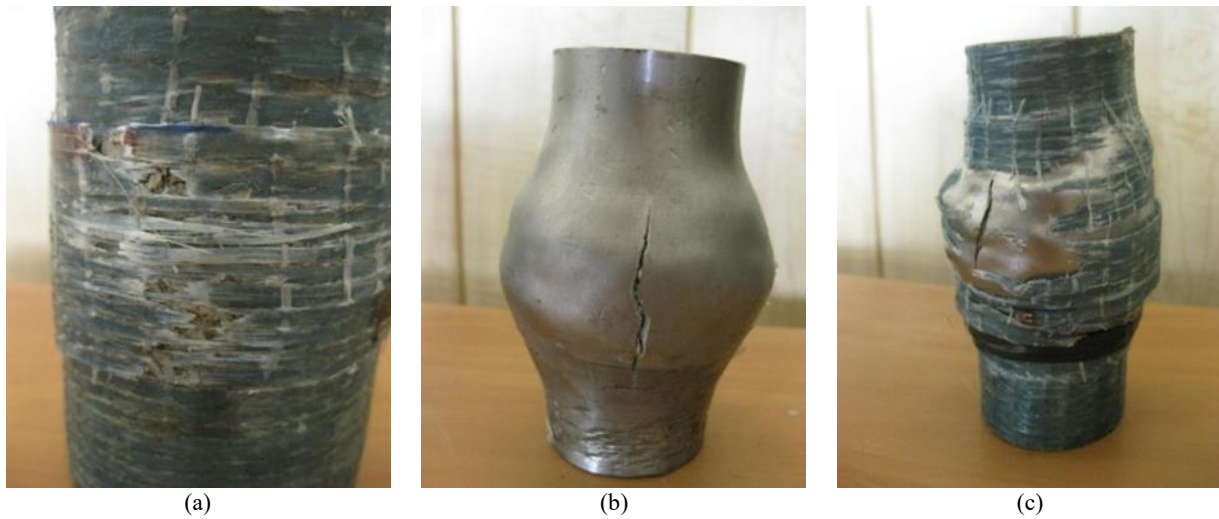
(a) Failure mode of an FRP-confined concrete specimen, (b) Failure mode of a steel tube-confined concrete specimen, and (c) Failure mode of a hybrid FRP–steel tube confined concrete specimen.
